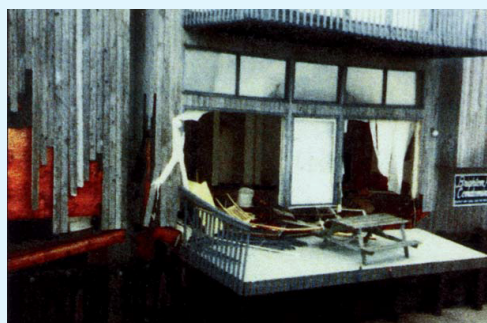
Damage to an oceanfront residence in Ocean City, New Jersey due to wave run-up on a timber bulkhead (Photograph by Mark Mauriello).
